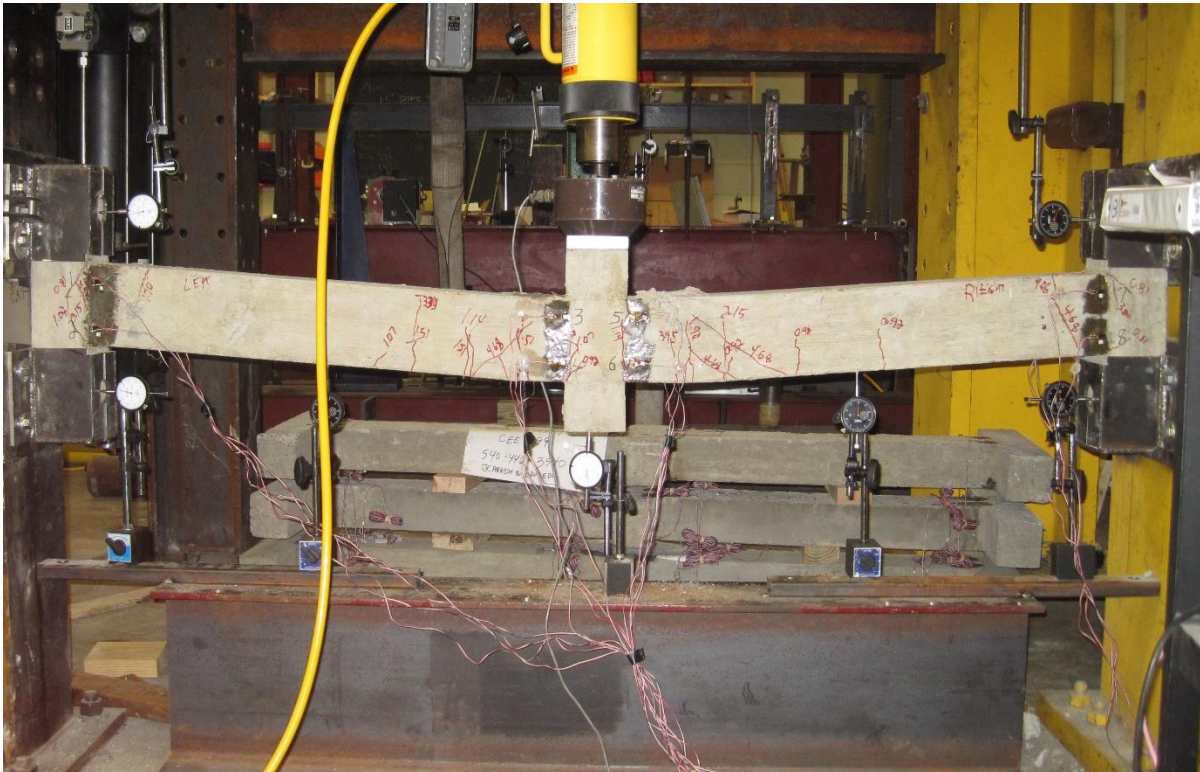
Crack Pattern at the Collapsed Load for Specimen B2-1
